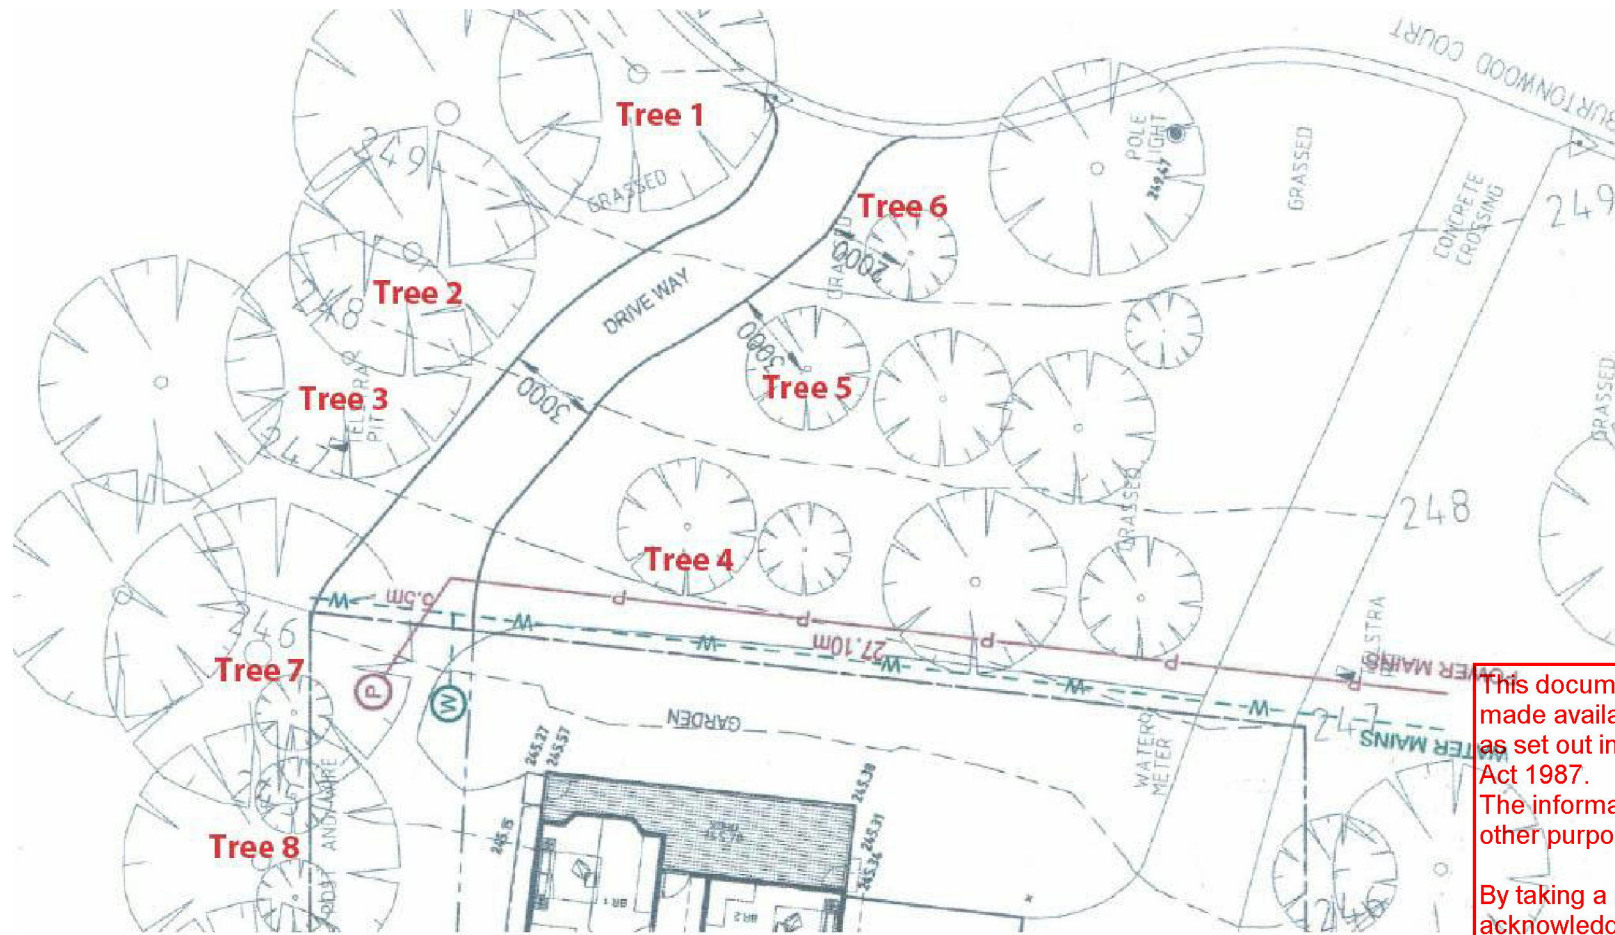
Site plan supplied by client and surveyor (P.Nolan 2025; Edited t
